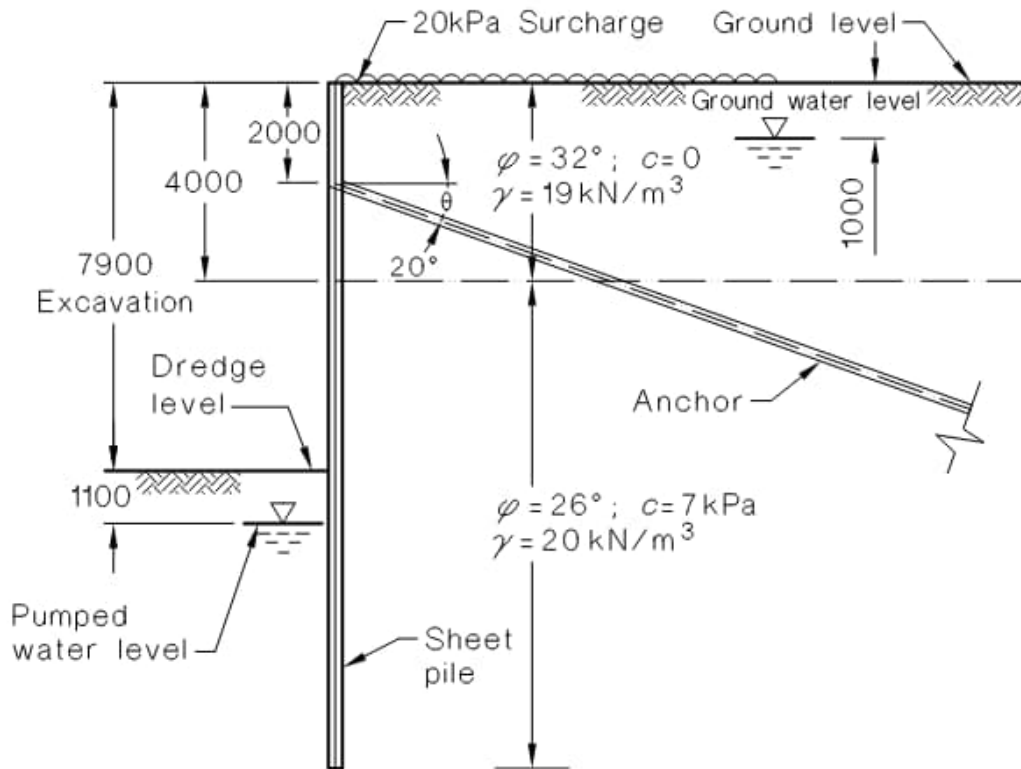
Embedded retaining wall example (extracted AS5100.3 Supplement 1 – 2008, millimetres)
